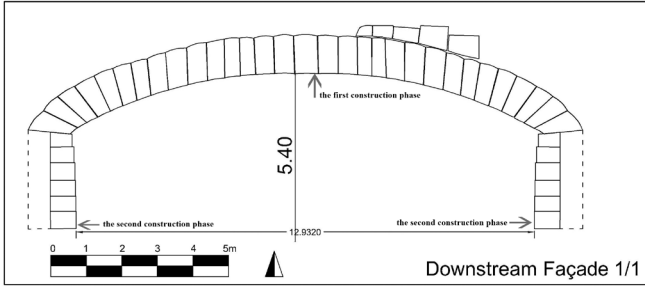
Front View Drawing of Downstream Façade (Drawing: İlkay Göçmen).
